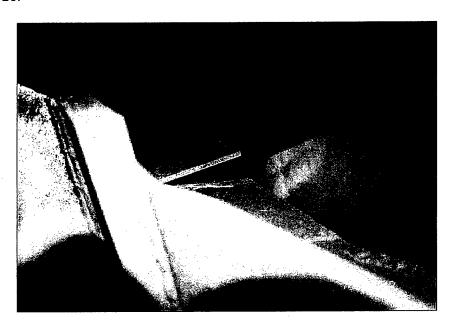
1 inch deflection in web of top left vertical brace at middle girder.
